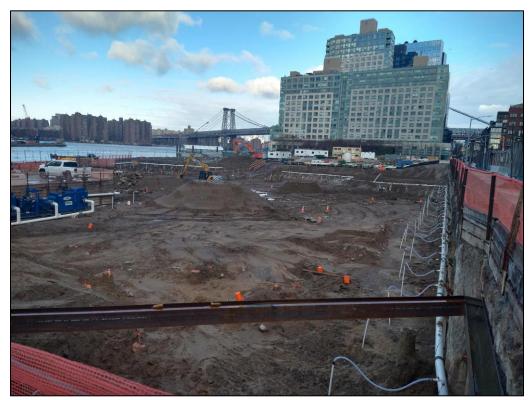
470 Kent Avenue site looking northwest from Kent Avenue and Division Avenue.
